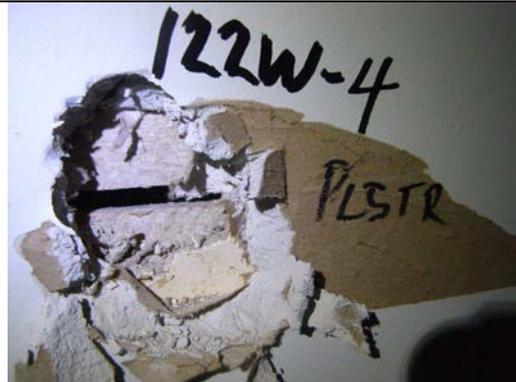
Plaster (122W-4) Living Room, Wall B.
